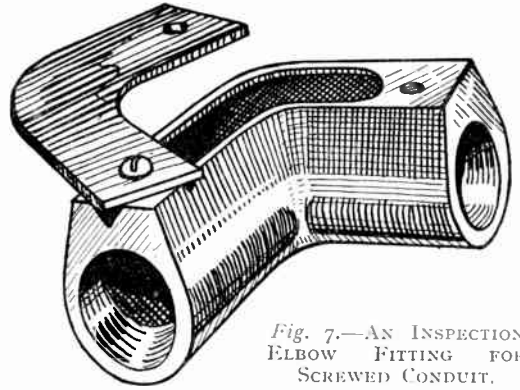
AN INSPECTION ELBOW FITTING FOR SCREWED CONDUIT.
